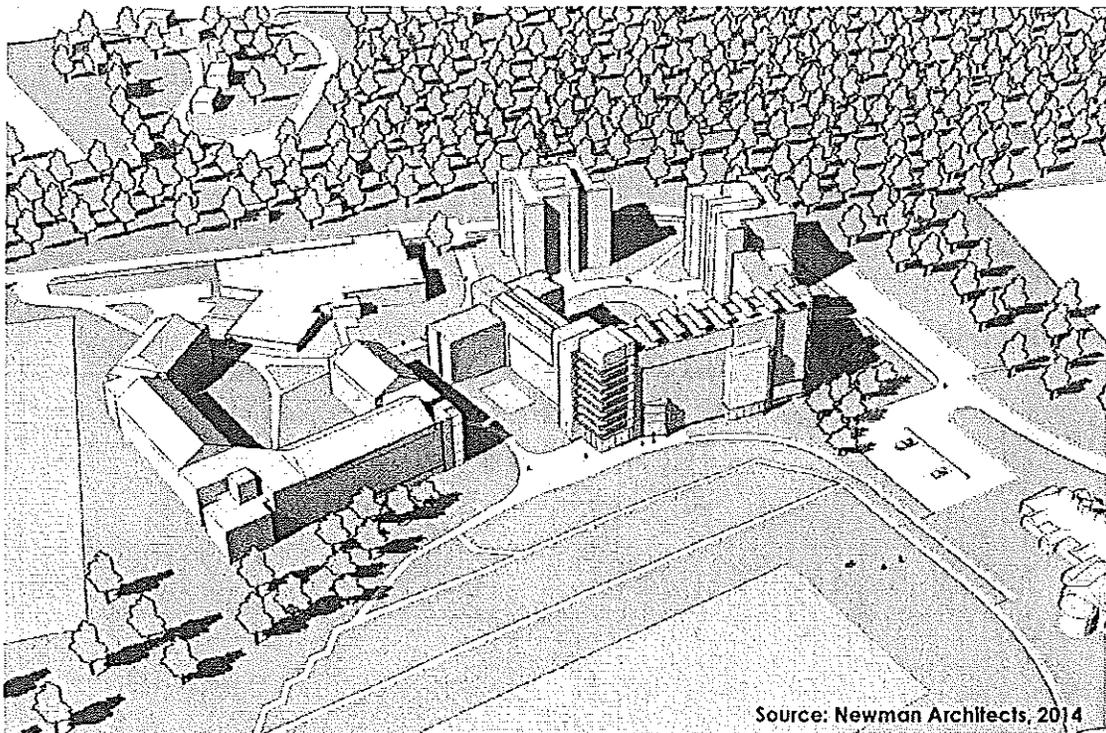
Proposed STEM Residence Hall Architectural Rendering Facing West
